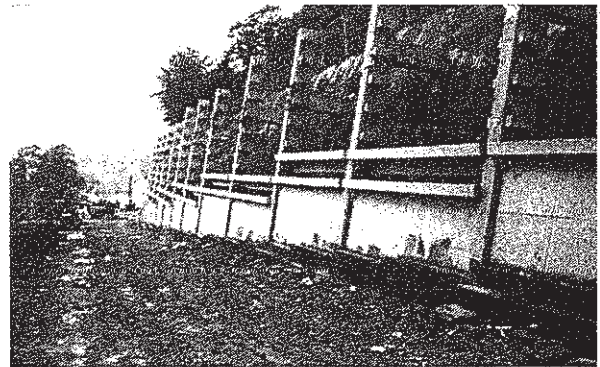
Installation of the prefabricated vertical columns and horizontal cast beams.
